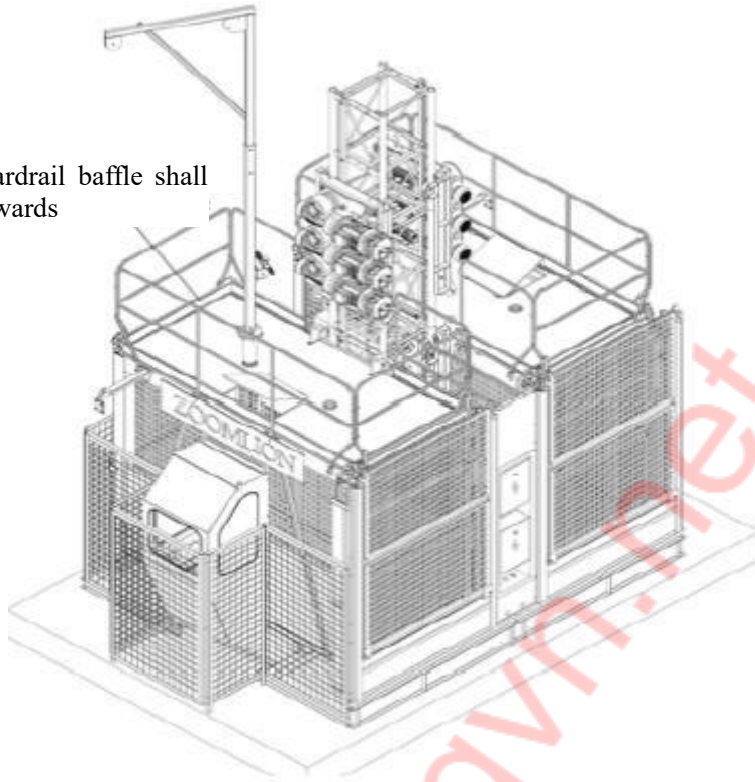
Erection of Main Structure (SC Construction Hoist)
